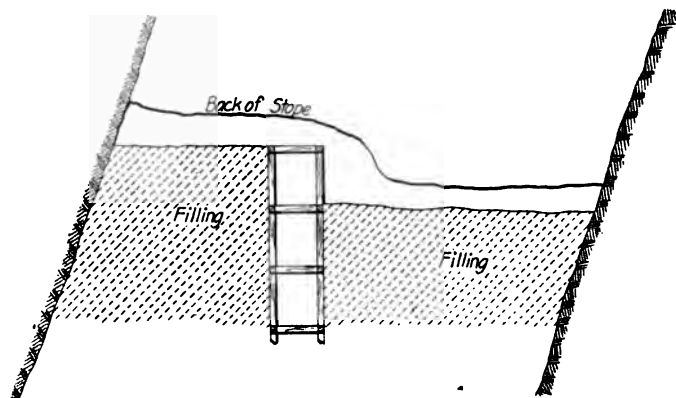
OPEN STOPE IN TWO FLOORS WHERE HANGING WALL IS WEAK.
